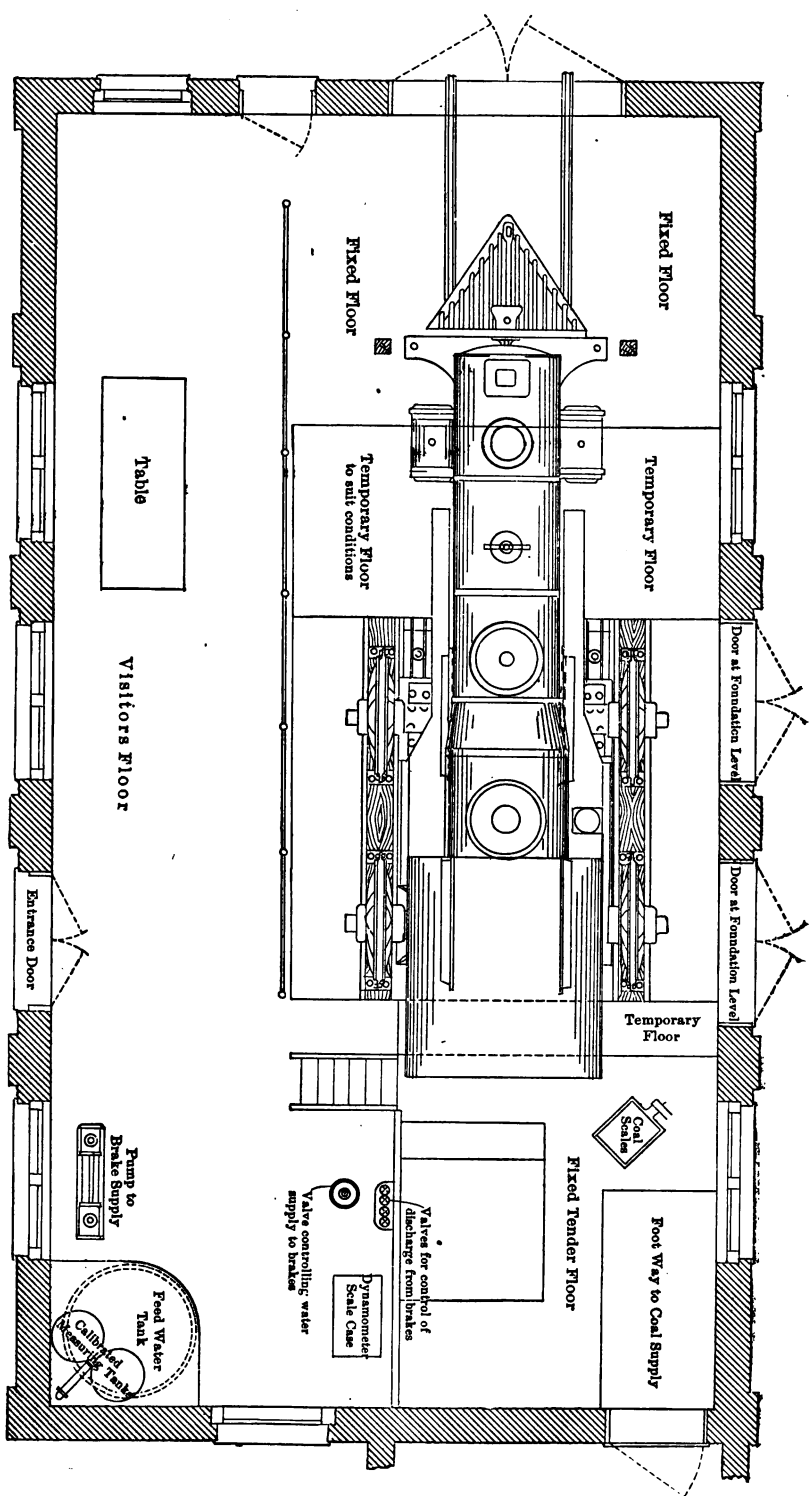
Floor-plan, Second Plant, Purdue University, 1894.
